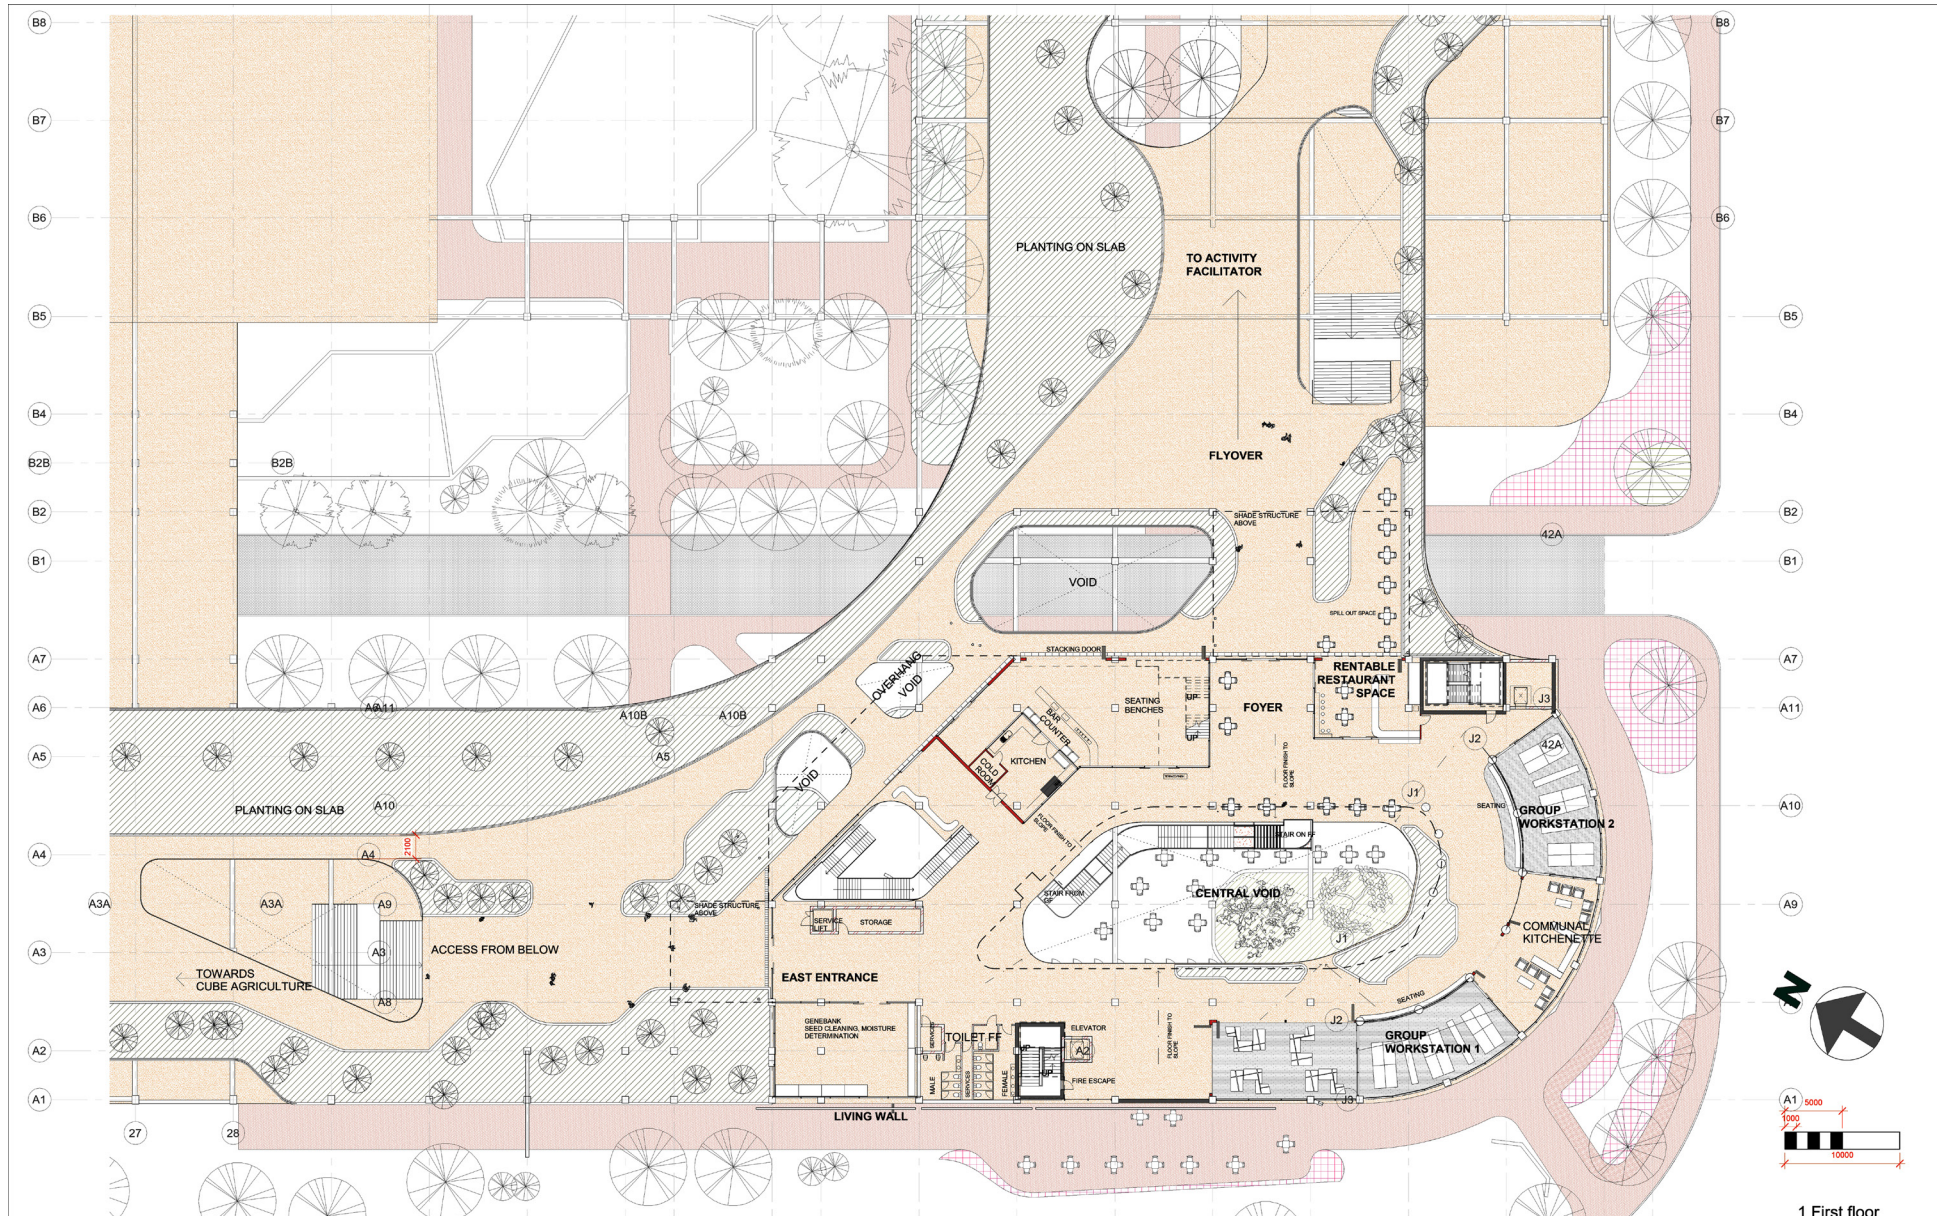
FIRST FLOOR PLAN (AUTHOR 2021)
